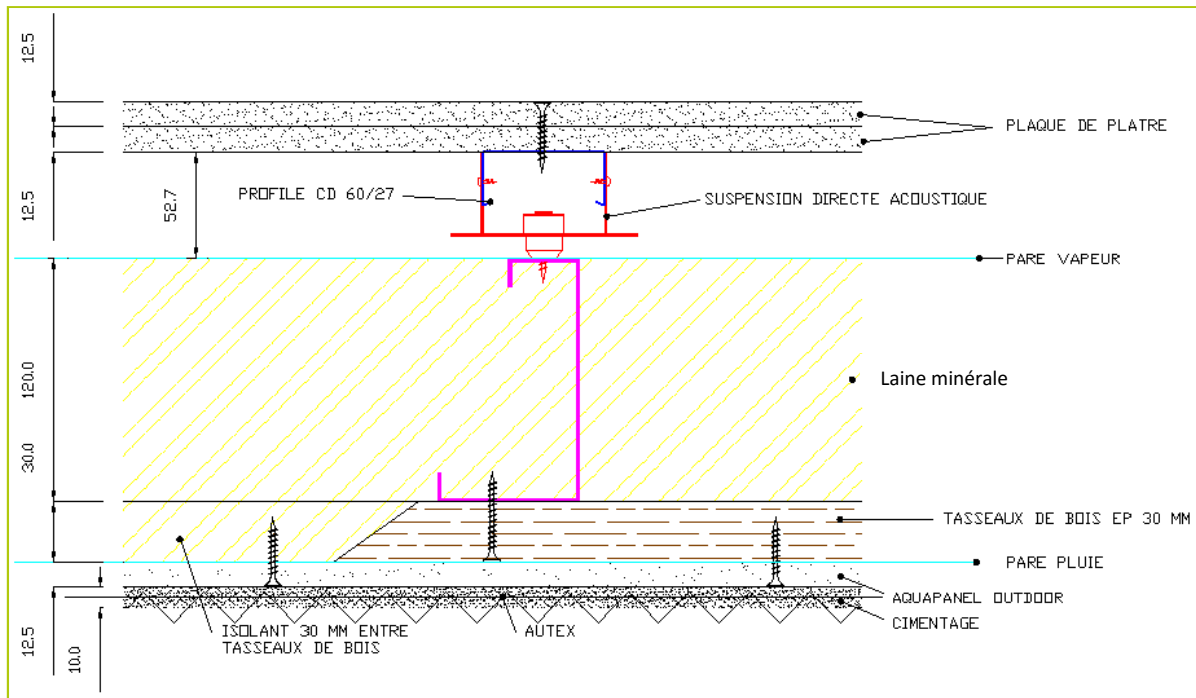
Composition (horizontal cut) of the new Styltech facade.
